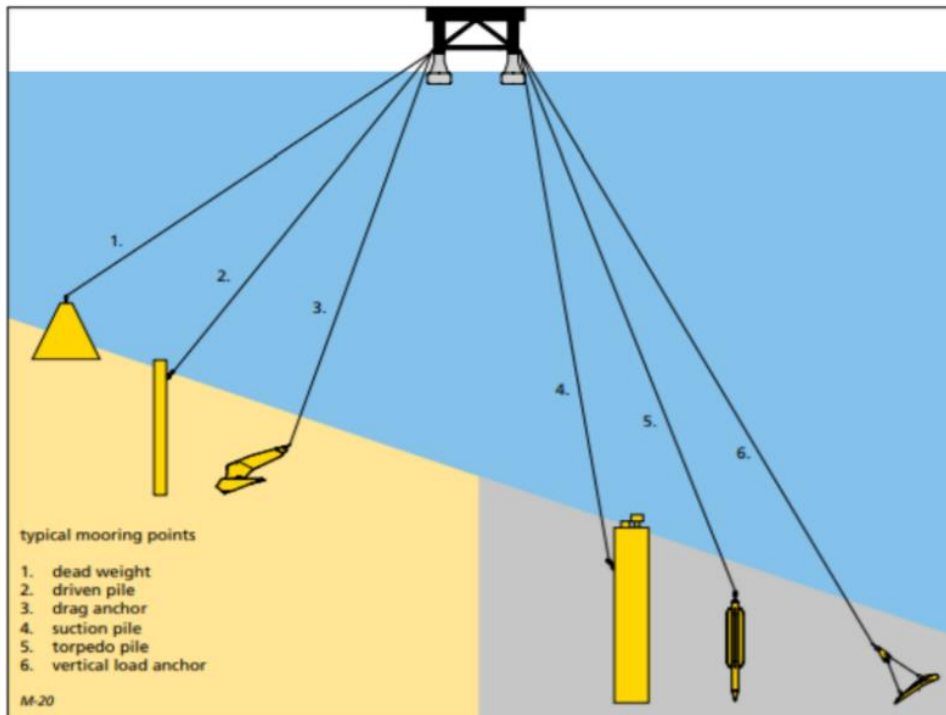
Typical mooring anchor types. Shown are dead weight (1), driven pile (2), drag embedment anchor (3), suction pile (4), torpedo pile (5) and a vertical load anchor (6) [71].
